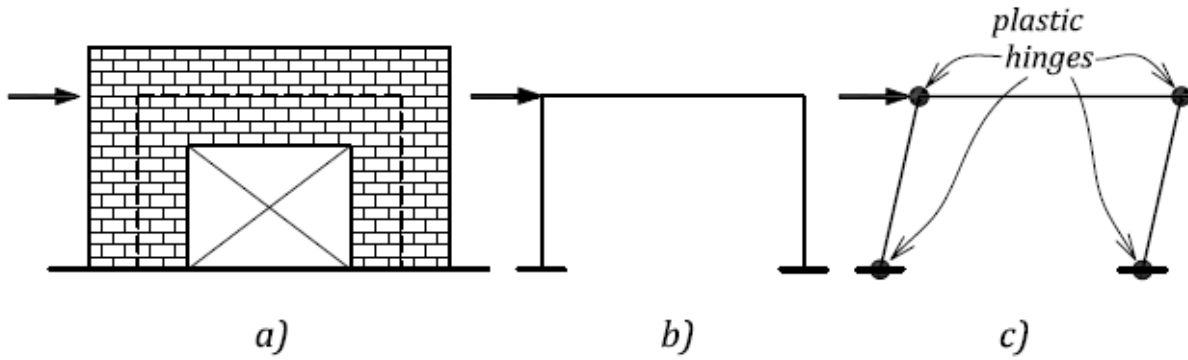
An example of a plastic collapse mechanism for a frame system: a) perforated masonry wall; b) frame model; c) plastic collapse mechanism.
